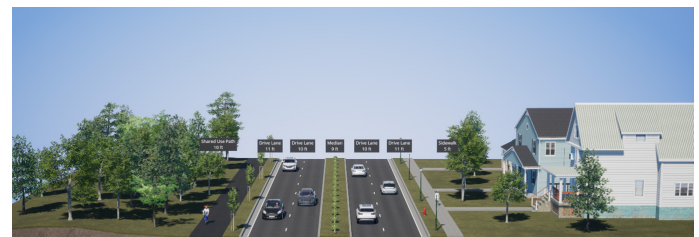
Proposed Palatka Road (KY 1142) to Southern Parkway/Iroquois Park Road
